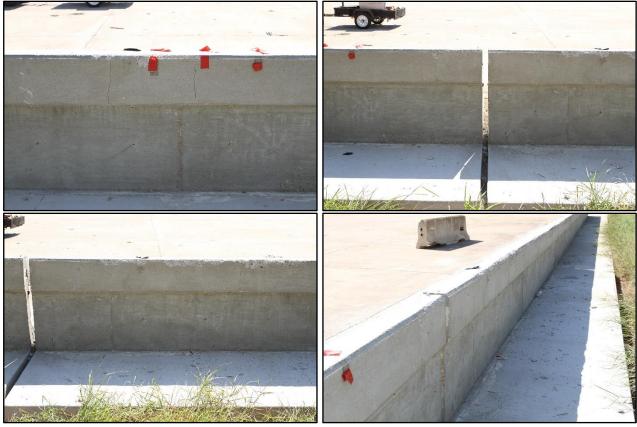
Field Side of SSTR without Dowel Bars and with Concrete Apron Extended Downstream of Barrier after Test No. 469680-02-3.
